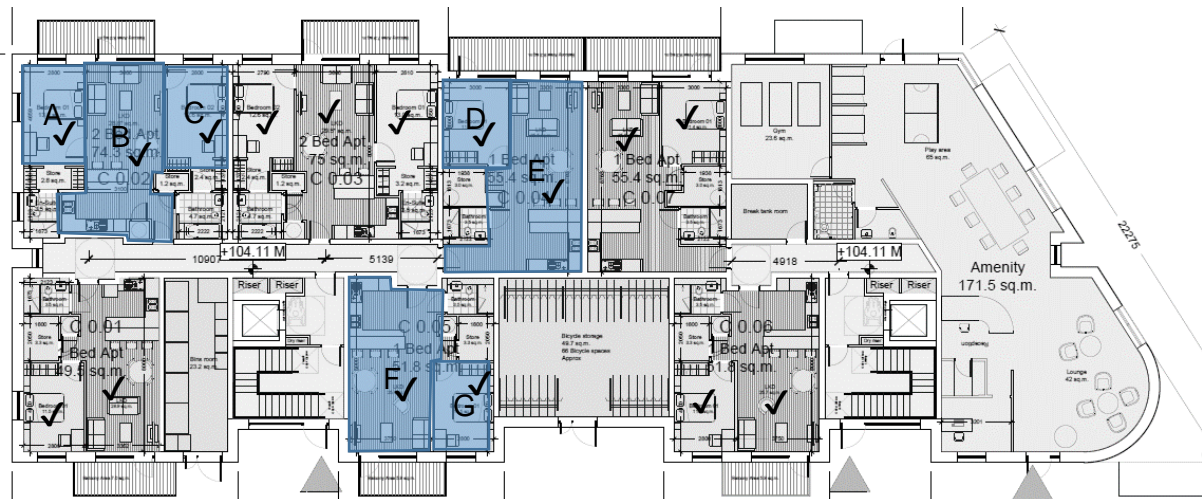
Block C - Ground Floor Assessed Rooms Highlighted in Blue
